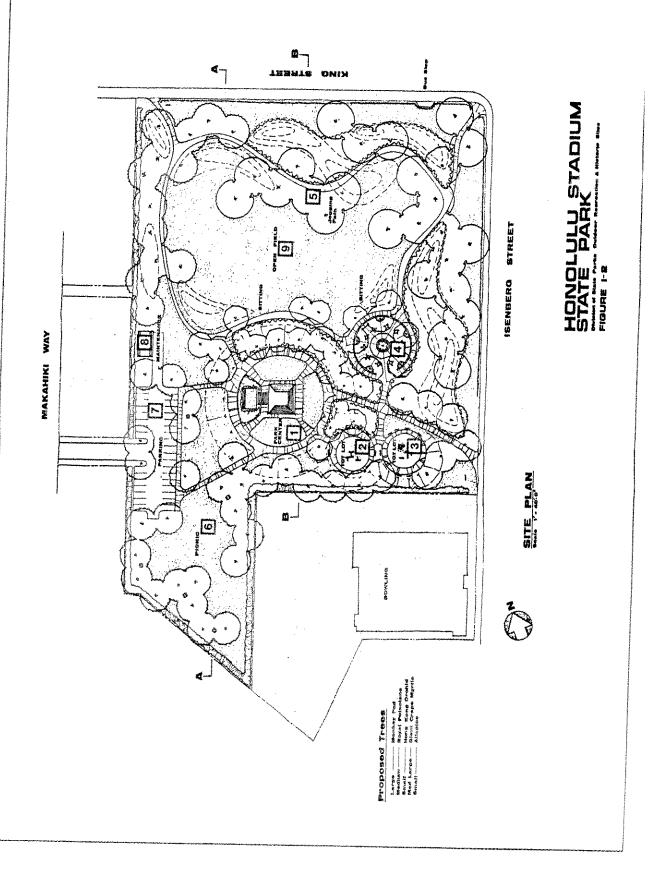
shows the site plan for the park. The site plan was developed following the guidelines of the conceptual plan. The site plan provides for a mix of
